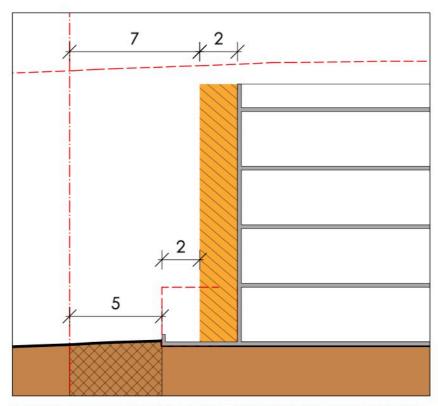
STREET SETBACK FOR GROUND FLOOR PRIVATE OPEN SPACE.
